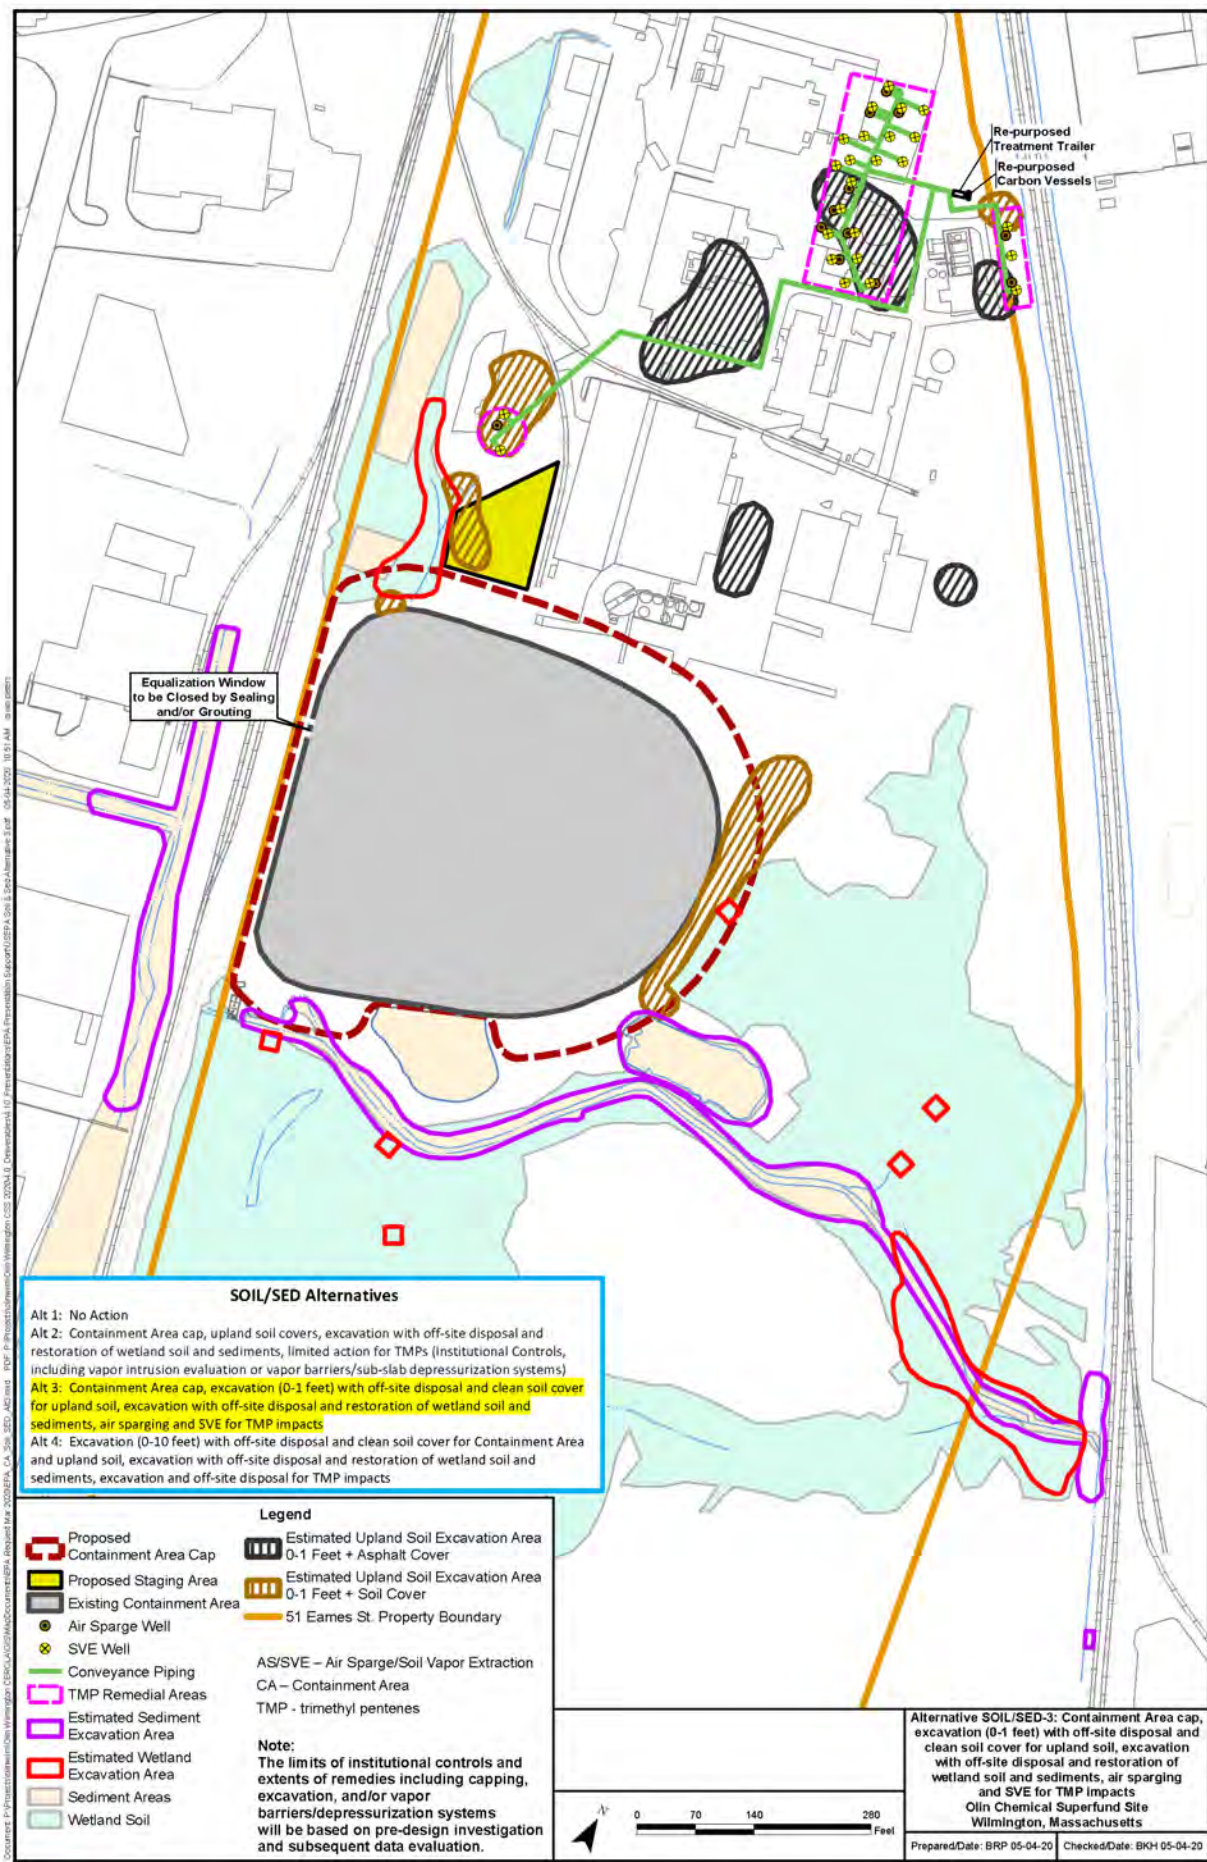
Conceptual plan for Alternative SOIL/SED-3. Containment Area cap, excavation (0-1 feet [ft]) with off-site disposal and clean soil cover for upland soil, excavation with off-site disposal and restoration of wetland soil and sediments, and air sparging and soil vapor extraction (SVE) for trimethylpentenes (TMPs).
